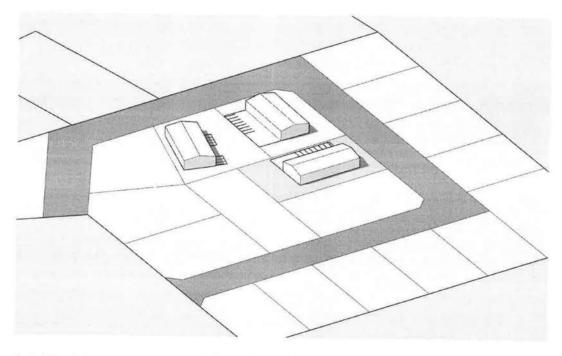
Elevated perspective of proposed building relative to adjoining buildings and the endorsed ODP.
